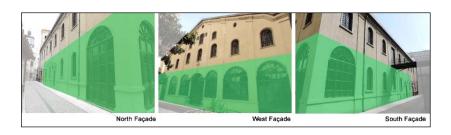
The first floor of the wall on north, west and south façades (Sönmez Pulat, 2019).
